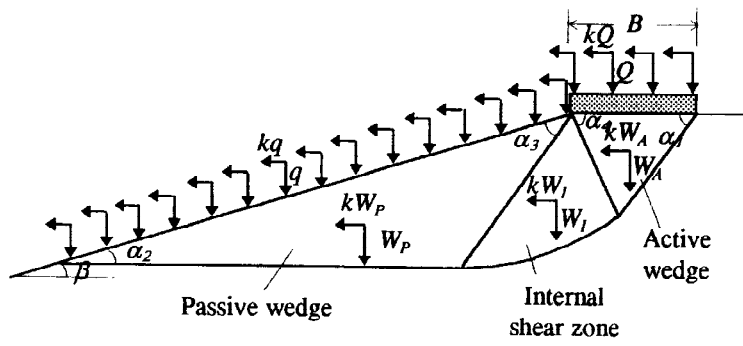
The failure mechanism and the applied forces of the foundation-soil system.
